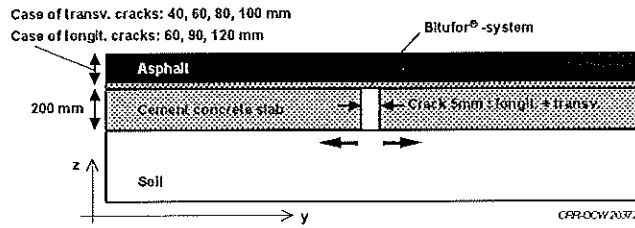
Overview of the road structures considered for the simulation of overlays on cement concrete slabs (thermal movements).
